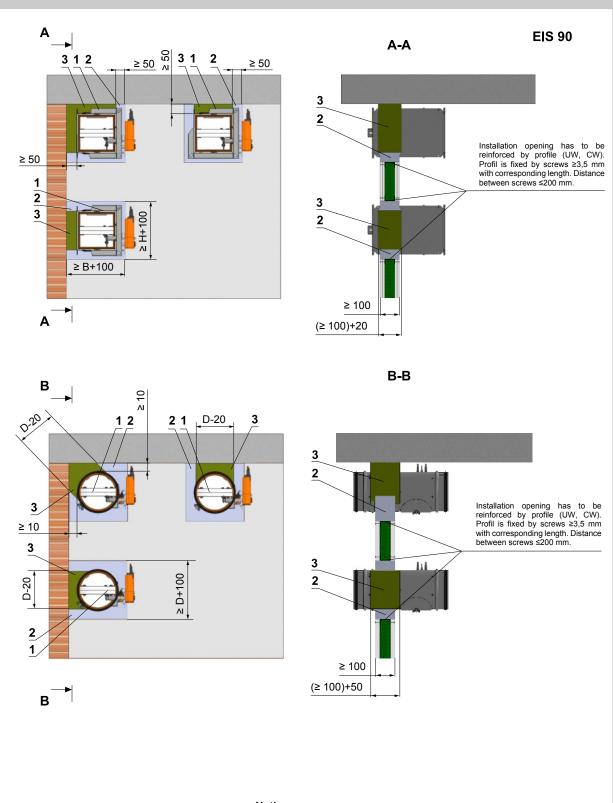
Gypsum wall construction - installation next to wall, ceiling - mortar or gypsum and mineral wool
